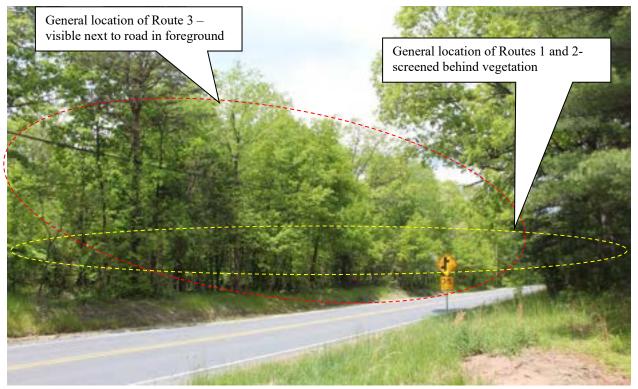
Photo location 3- View from edge of Manning House property along Sycolin Road, facing northwest. Routes 1 and 2 are screened by vegetation. Routes 3 visible along road in foreground.
